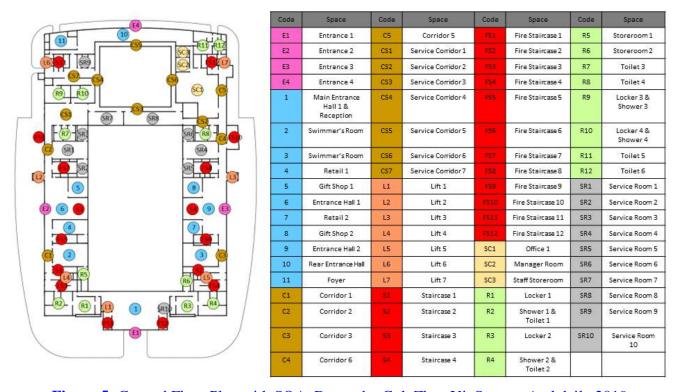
Ground Floor Plan with SOA. Drawn by Goh Zhen Yi. Source: Archdaily,2019
